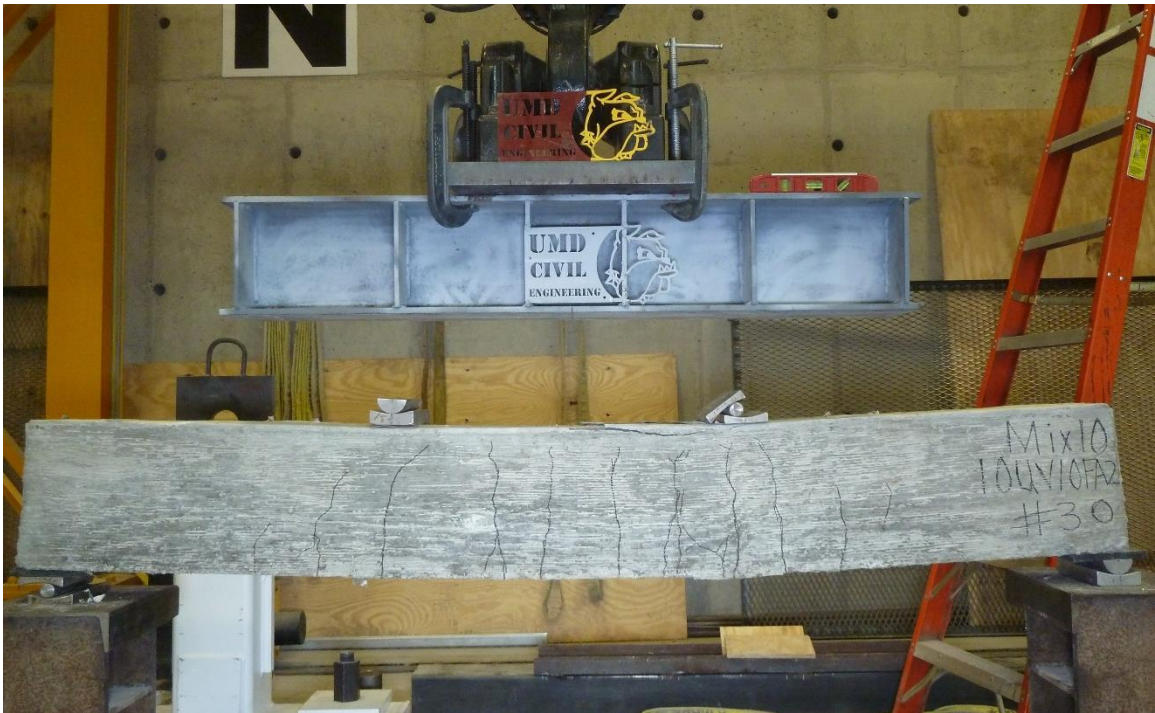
Mixture 10 (10UV10FA2) beam #30: concrete beam after testing.
